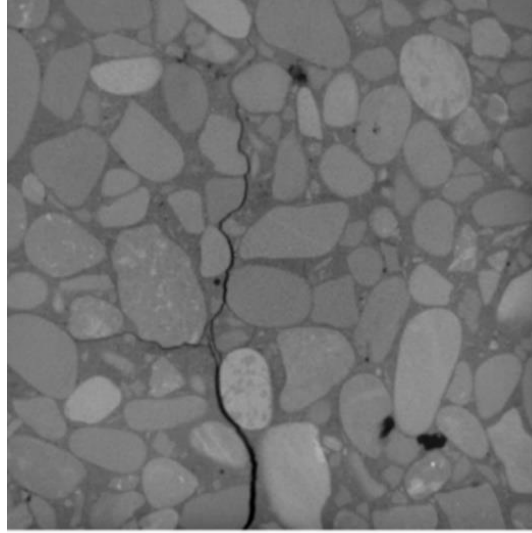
CT Image of Preferred Path of Concrete Cracking due to Corrosion of a 12 mm Rebar.
